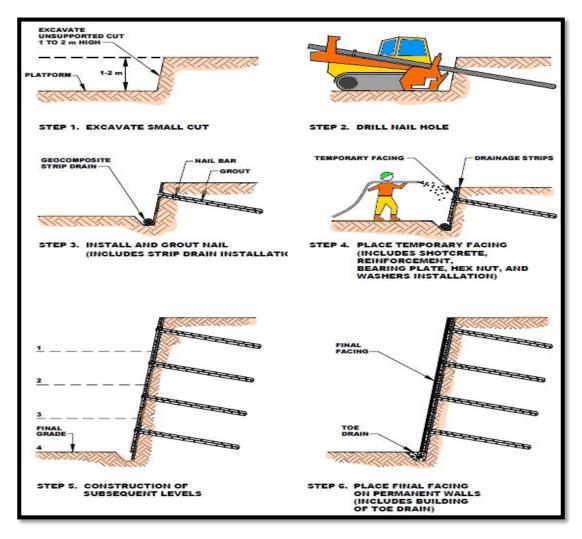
Usual construction of the soil nailed wall. Porterfield et al. (1994)
